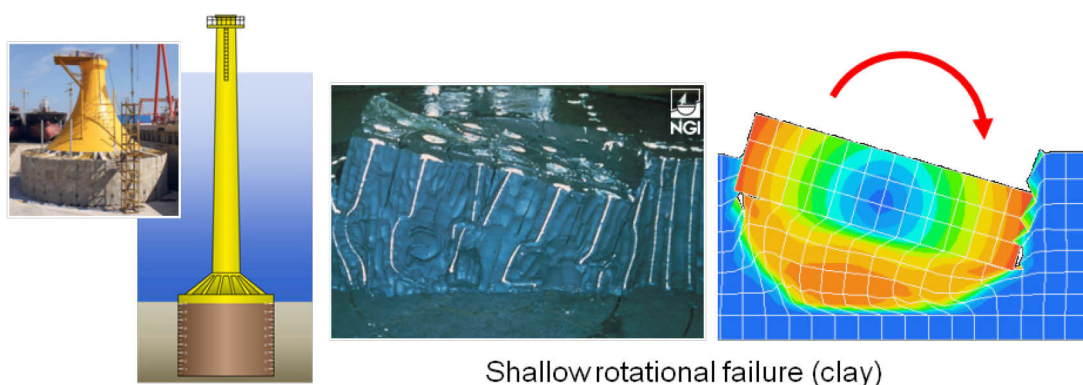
Mono caisson OWT foundations and critical failure mechanism in clay
